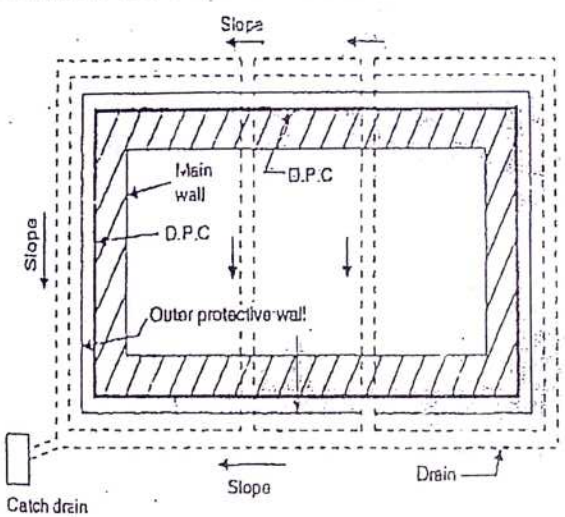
PLAN SHOWING LAYOUT OF DRAINS.
